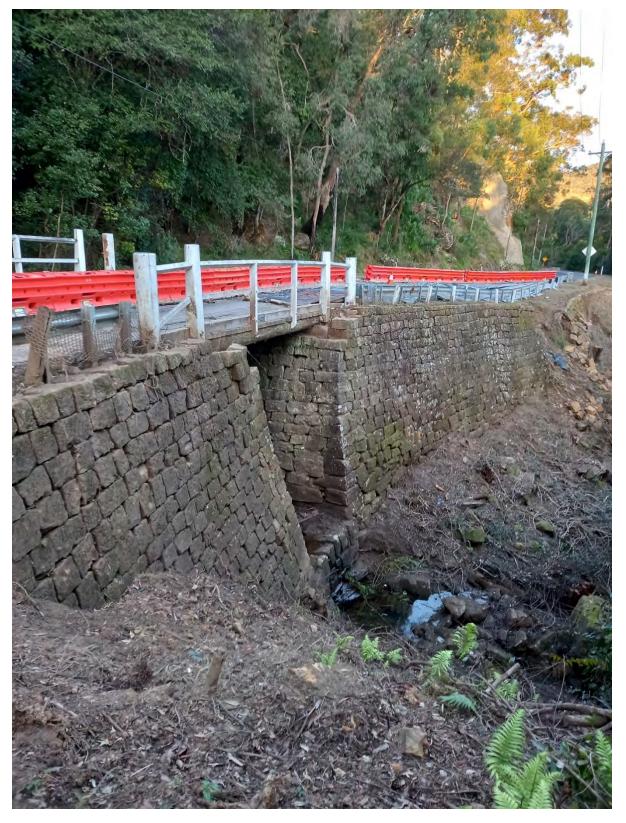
View of the bridge and stone abutments on the riverside. A collapsed section of slope can be seen at top right. (Source: OCP Architects, 2022.)
